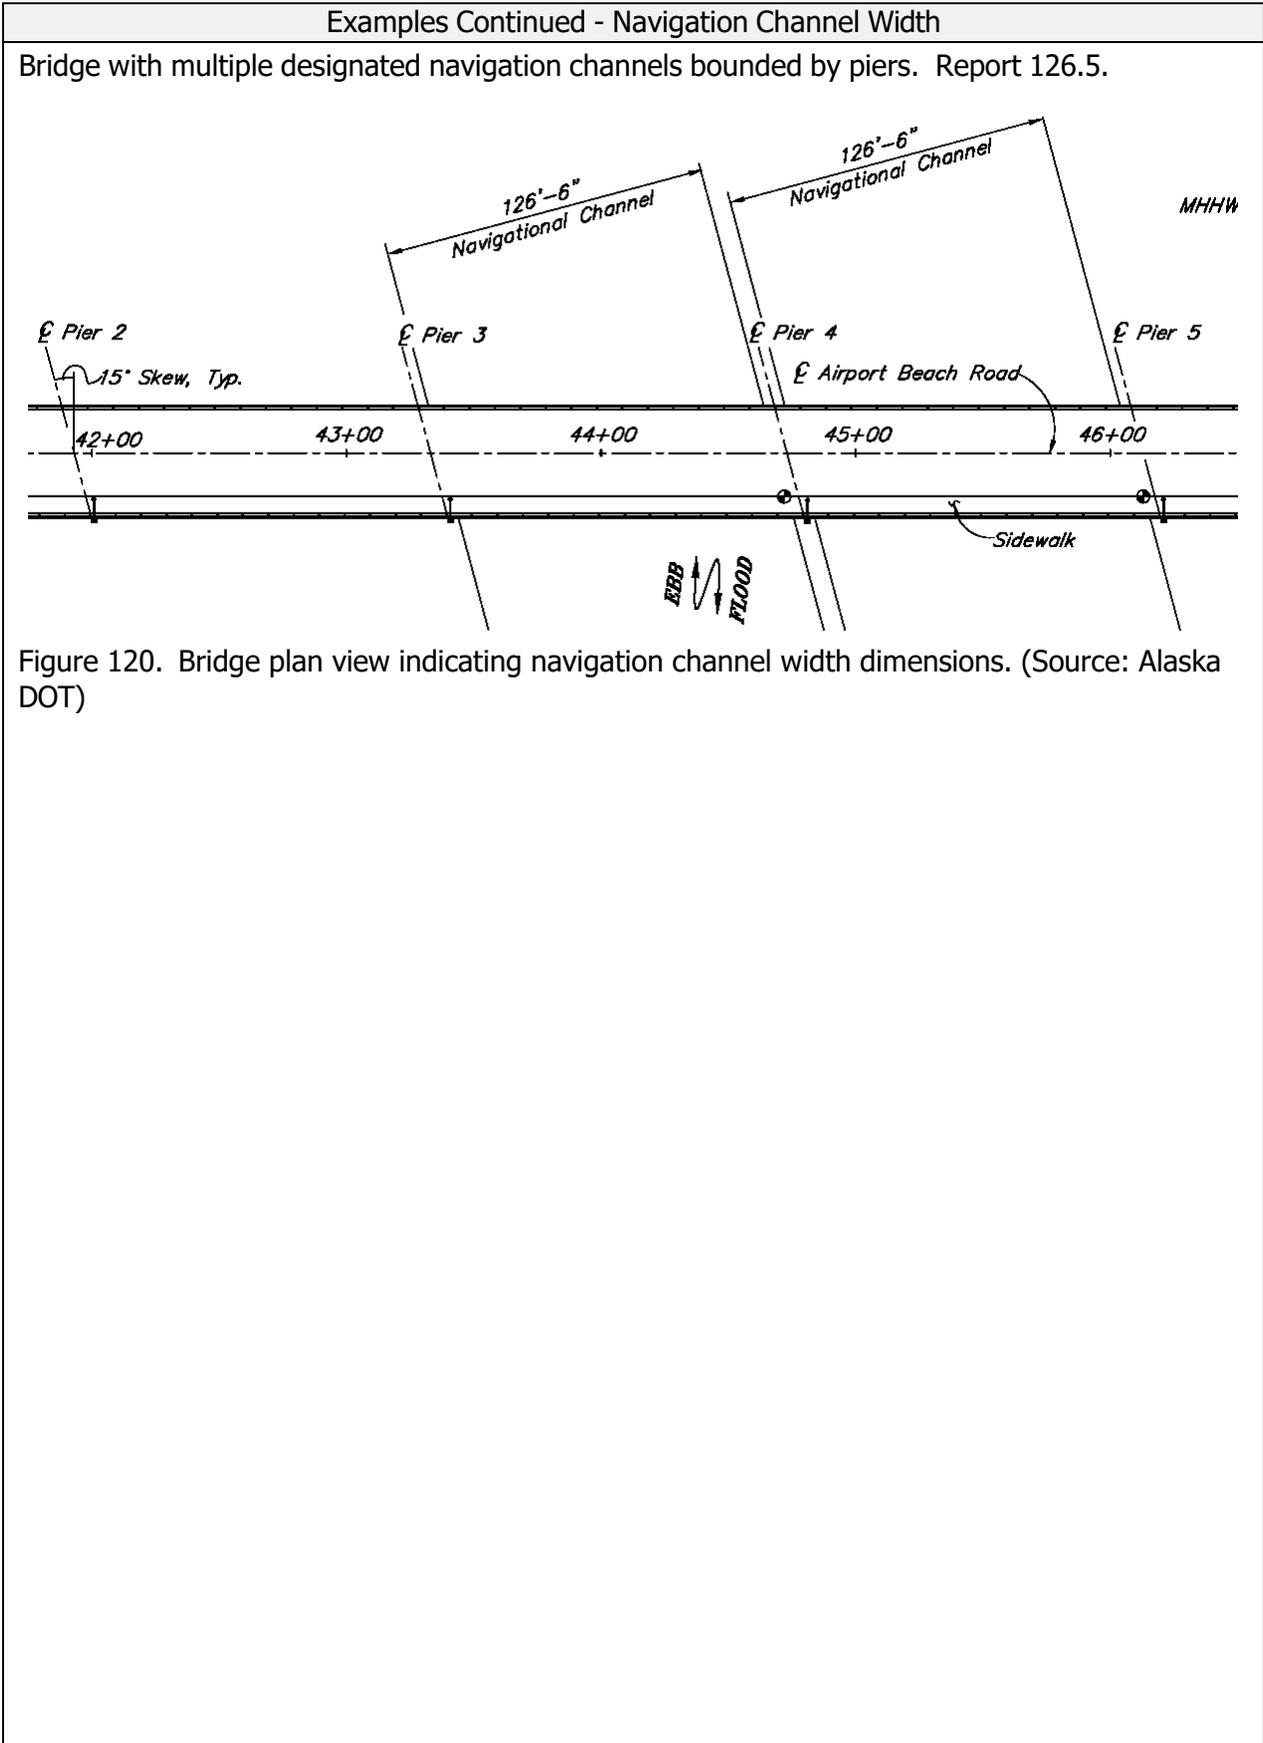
Bridge plan view indicating navigation channel width dimensions. (Source: Alaska DOT)
